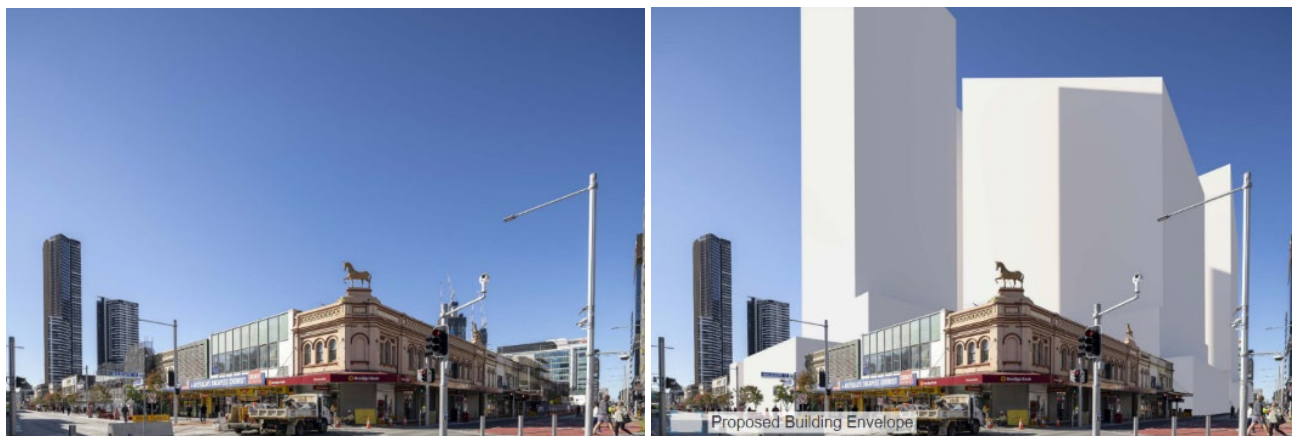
Viewpoint 01: Existing (left) and with proposed building envelope (right)
